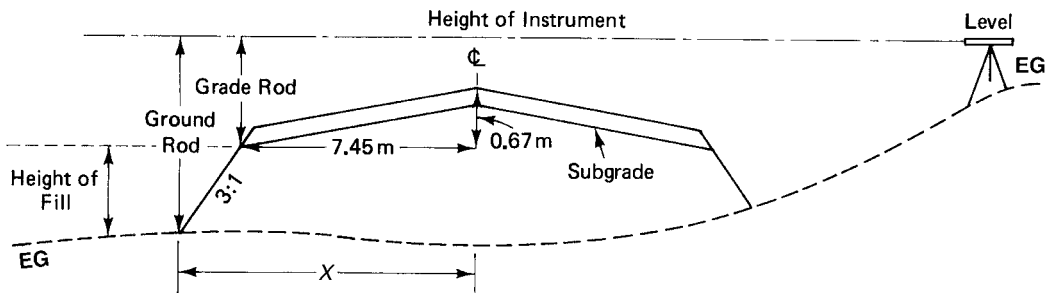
Location of slope stakes in a fill section. Case 1: instrument HI above subgrade.
